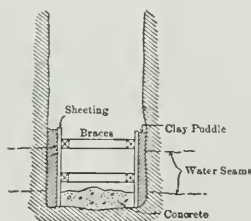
First Method of Handling Water in Core-Wall Ditch.
